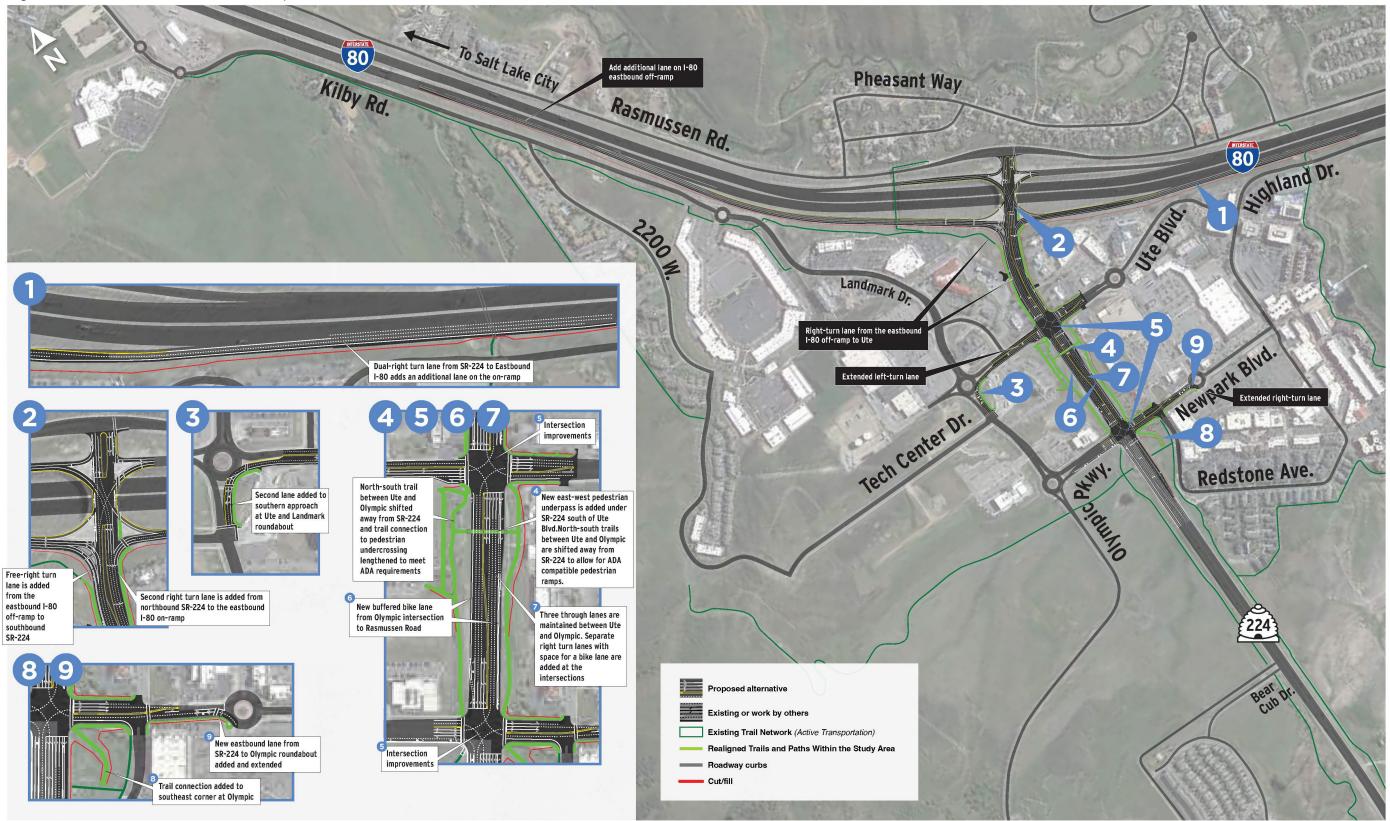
Alternative C: Intersection Improvements with Pedestrian Enhancements
